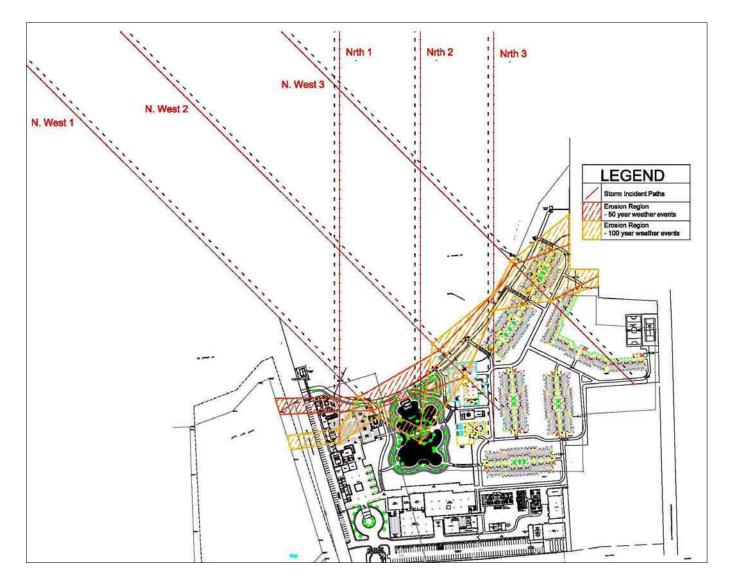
Site plan showing 50 yr storm surge hazard area on the existing ground levels
